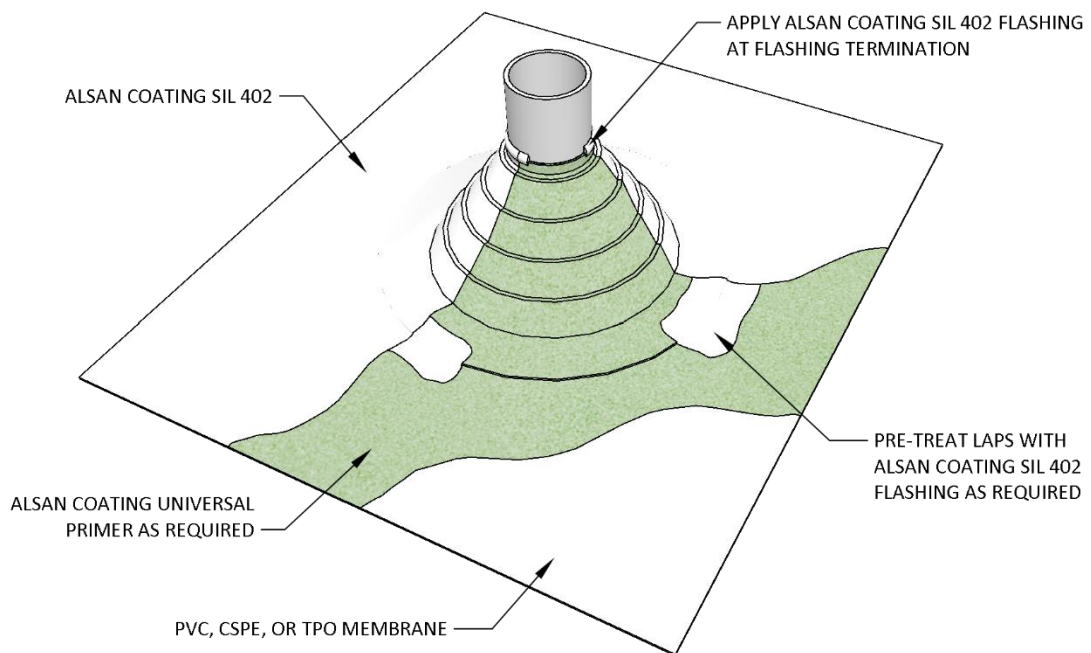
Silicone Roof Coating Over TPO/CSPE/PVC, Penetration
